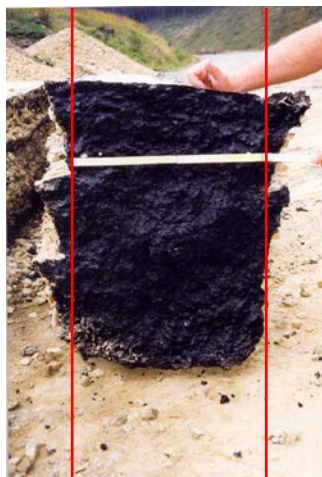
Typical cross section of an asphalt concrete core taken from trial field with minimum core thickness (red lines)
